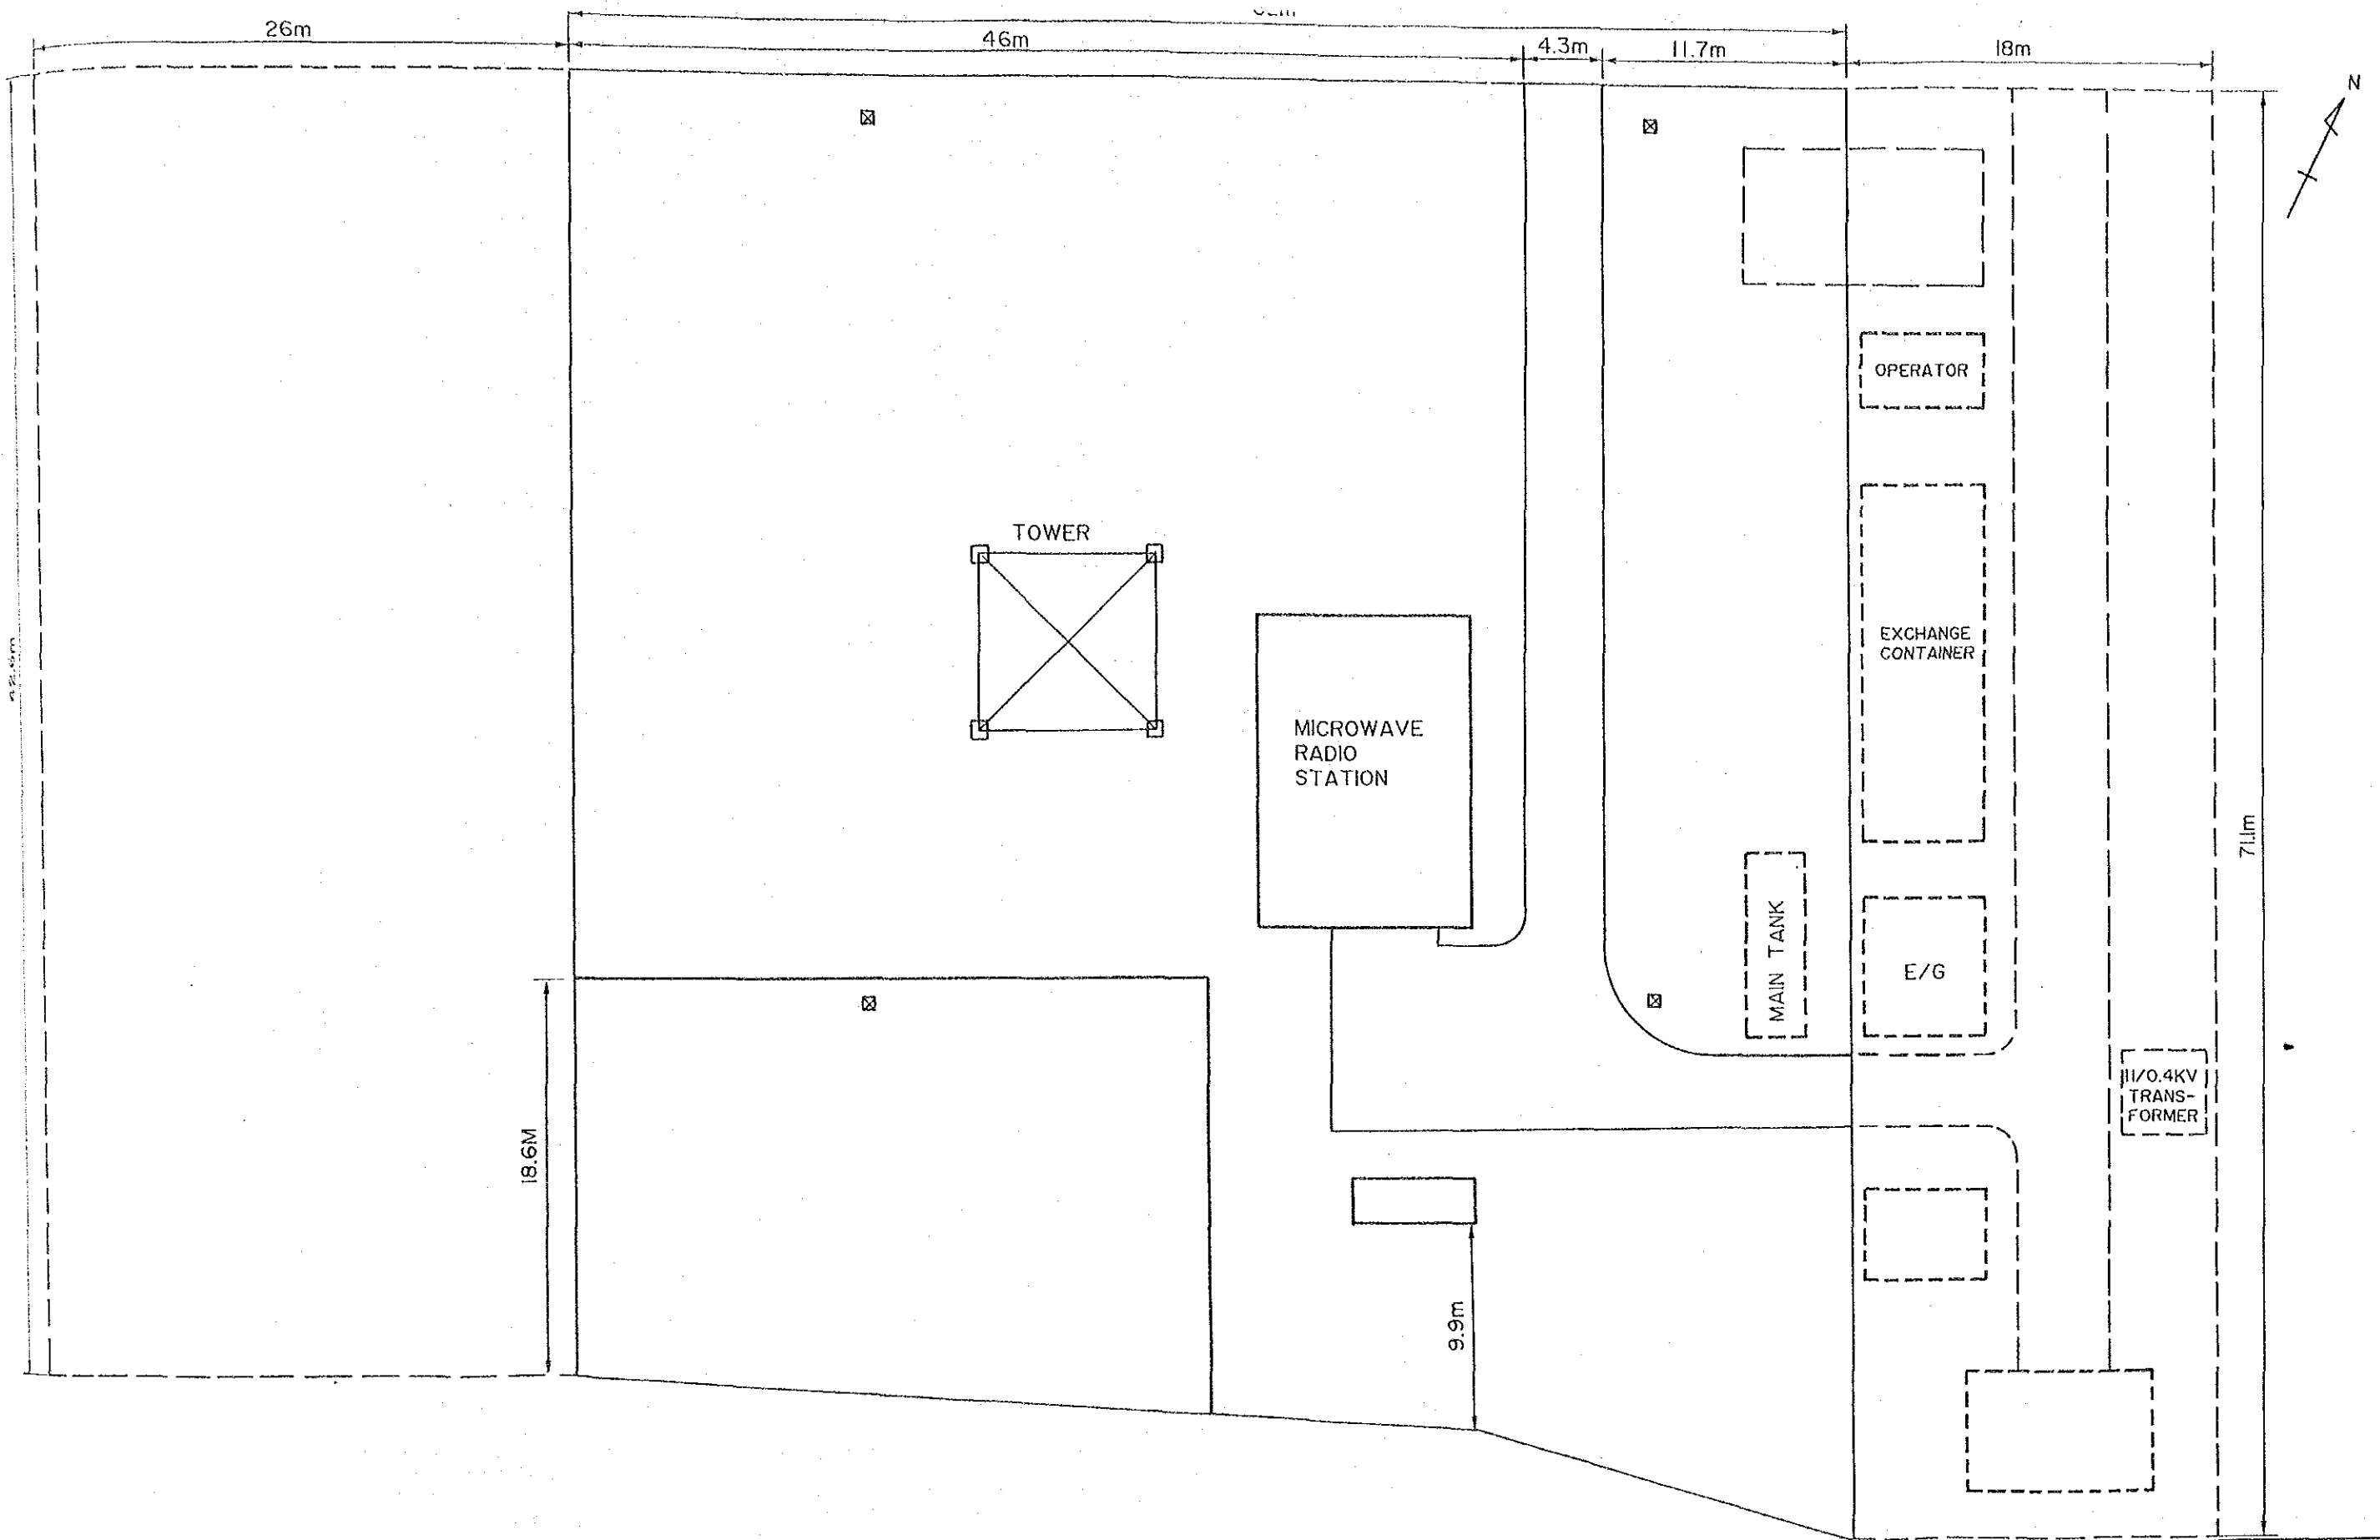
Site Layout Plan at Tharrawaddy New Exchange Office
